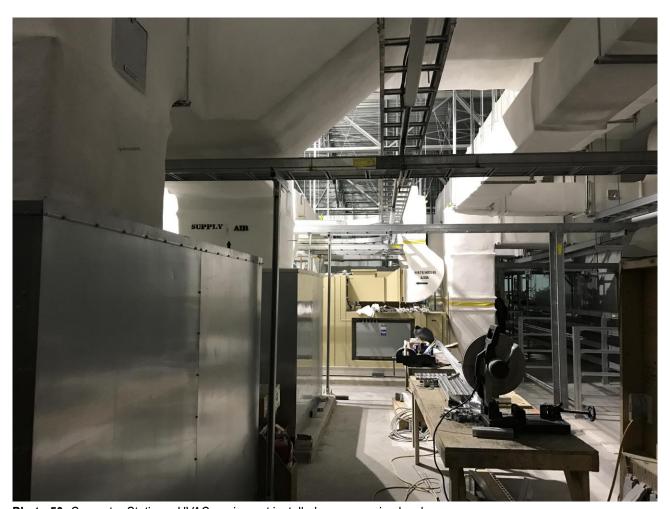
Converter Station – HVAC equipment installed on mezzanine level.
